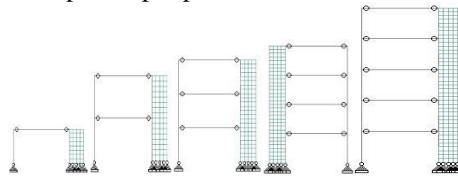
Hinged Base, Shear Connected Columns and Beams with Shear Wall Single bay system
